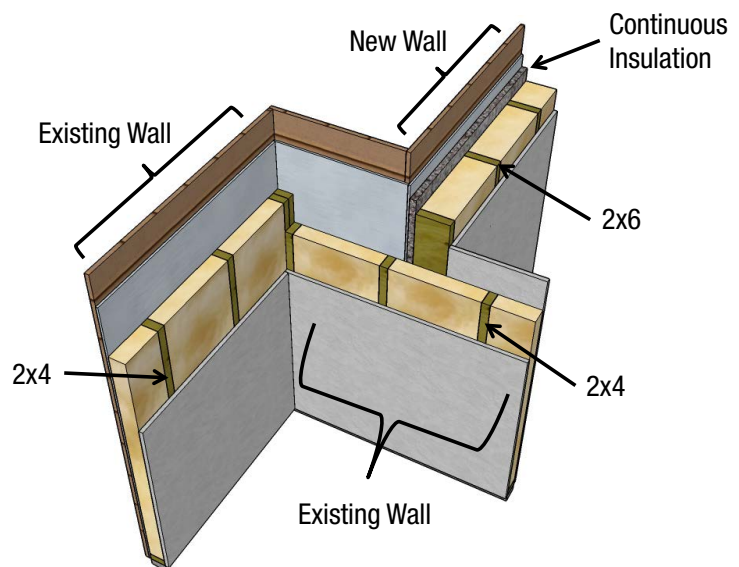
The new wall extends out perpendicularly from the existing wall.
